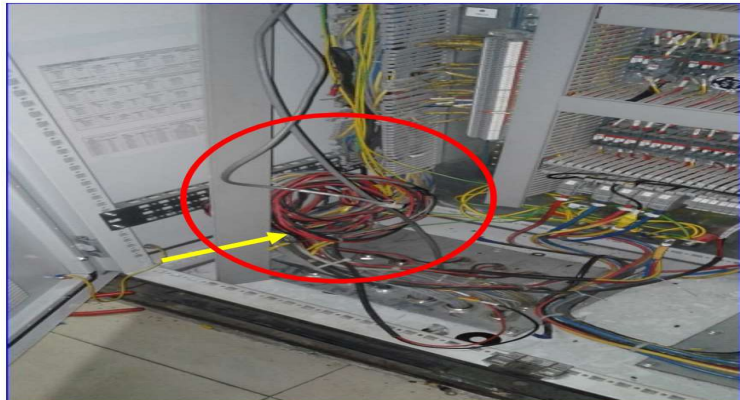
BUNDLE OF CABLE IN PANEL TO BE REMOVED
